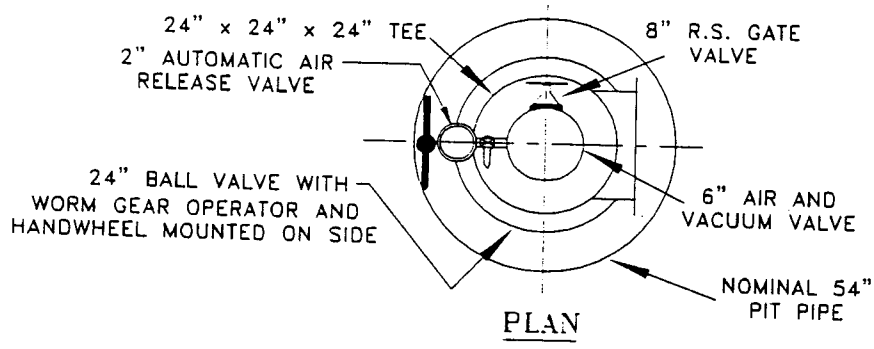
IW-1 WELL CONSTRUCTION DETAILS.
